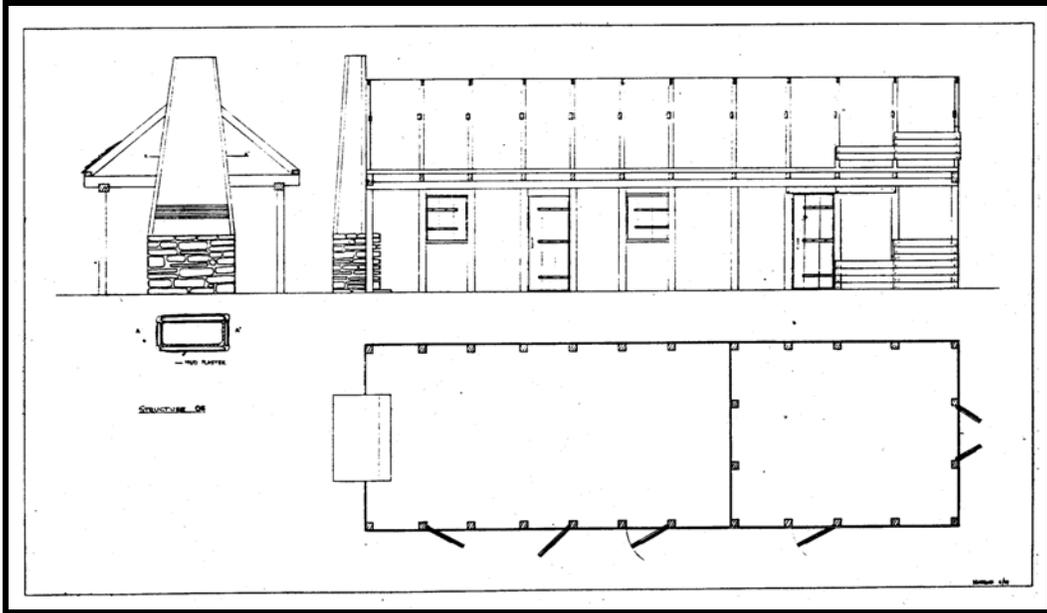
Architectural Plan for Structure 5 Reconstruction. Compare with Figures 68 and 216.
